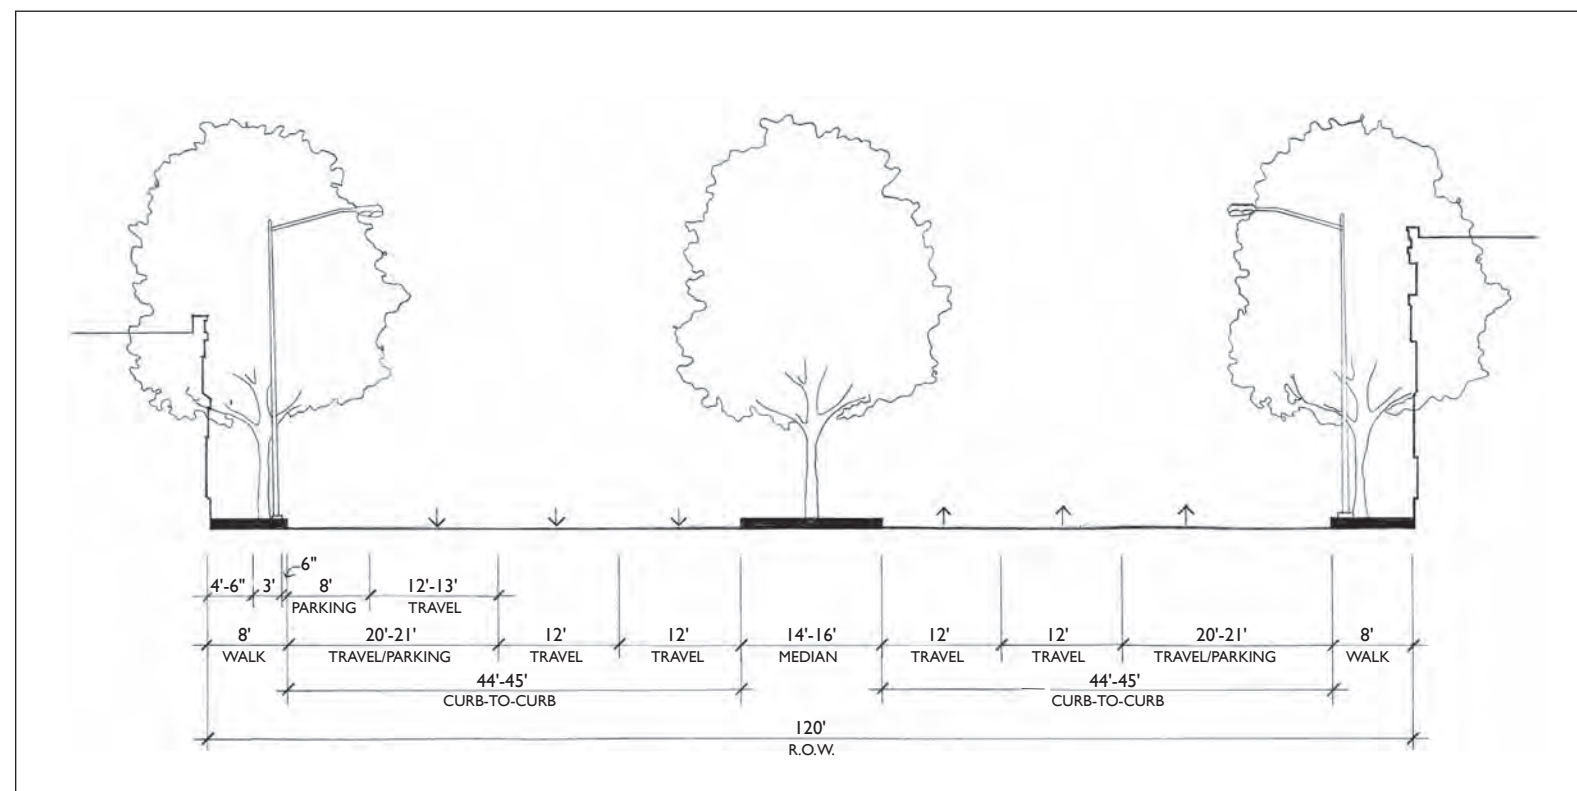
Typical existing 120-foot R.O.W. cross section
